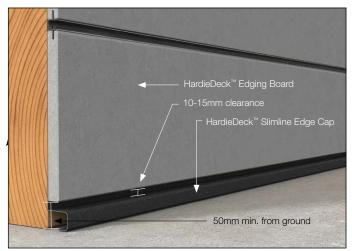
BOTTOM FINISHING DETAIL AND CLEARANCE
